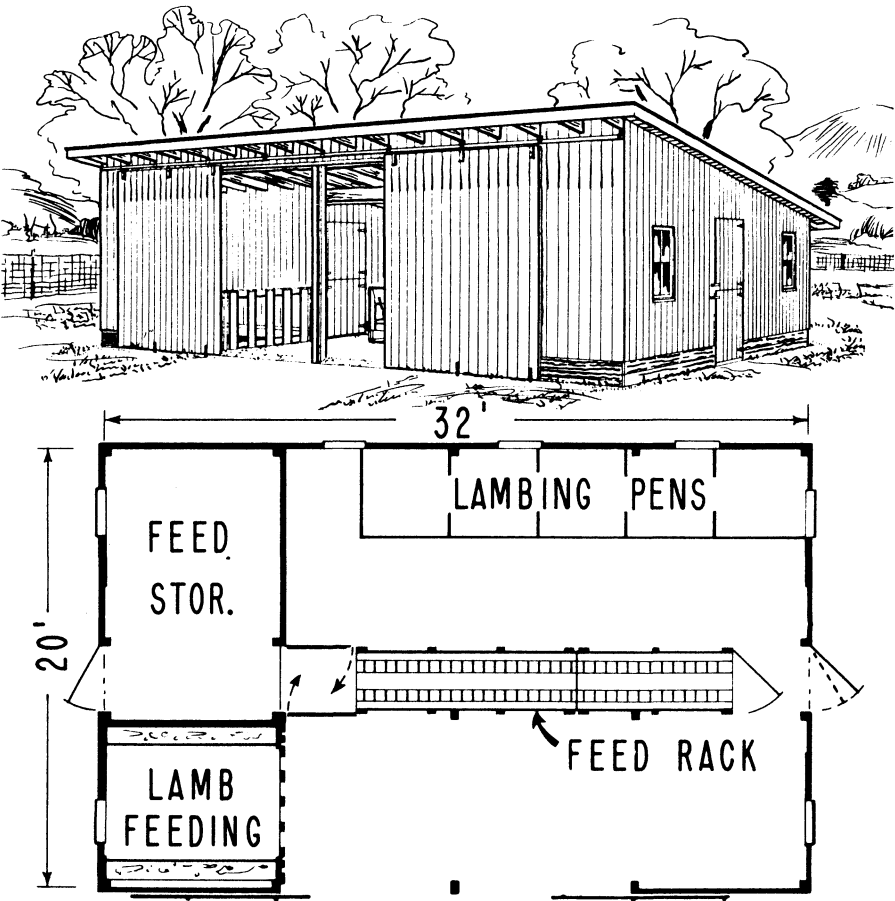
Above, complete unit for a small flock of sheep; below, dimensions and interior arrangement. (USDA Plan 5919)
